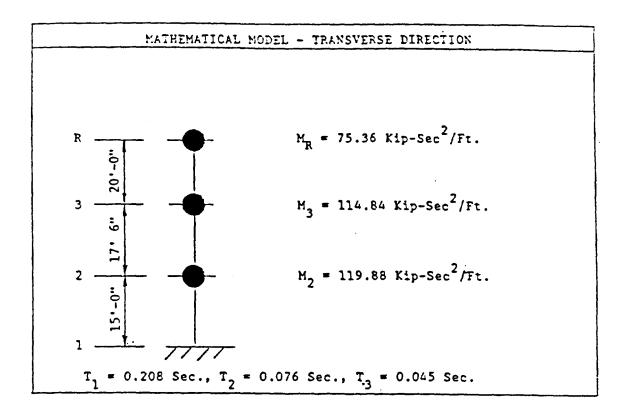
Brick building with concrete framing system (Sheet 18 of 25)
